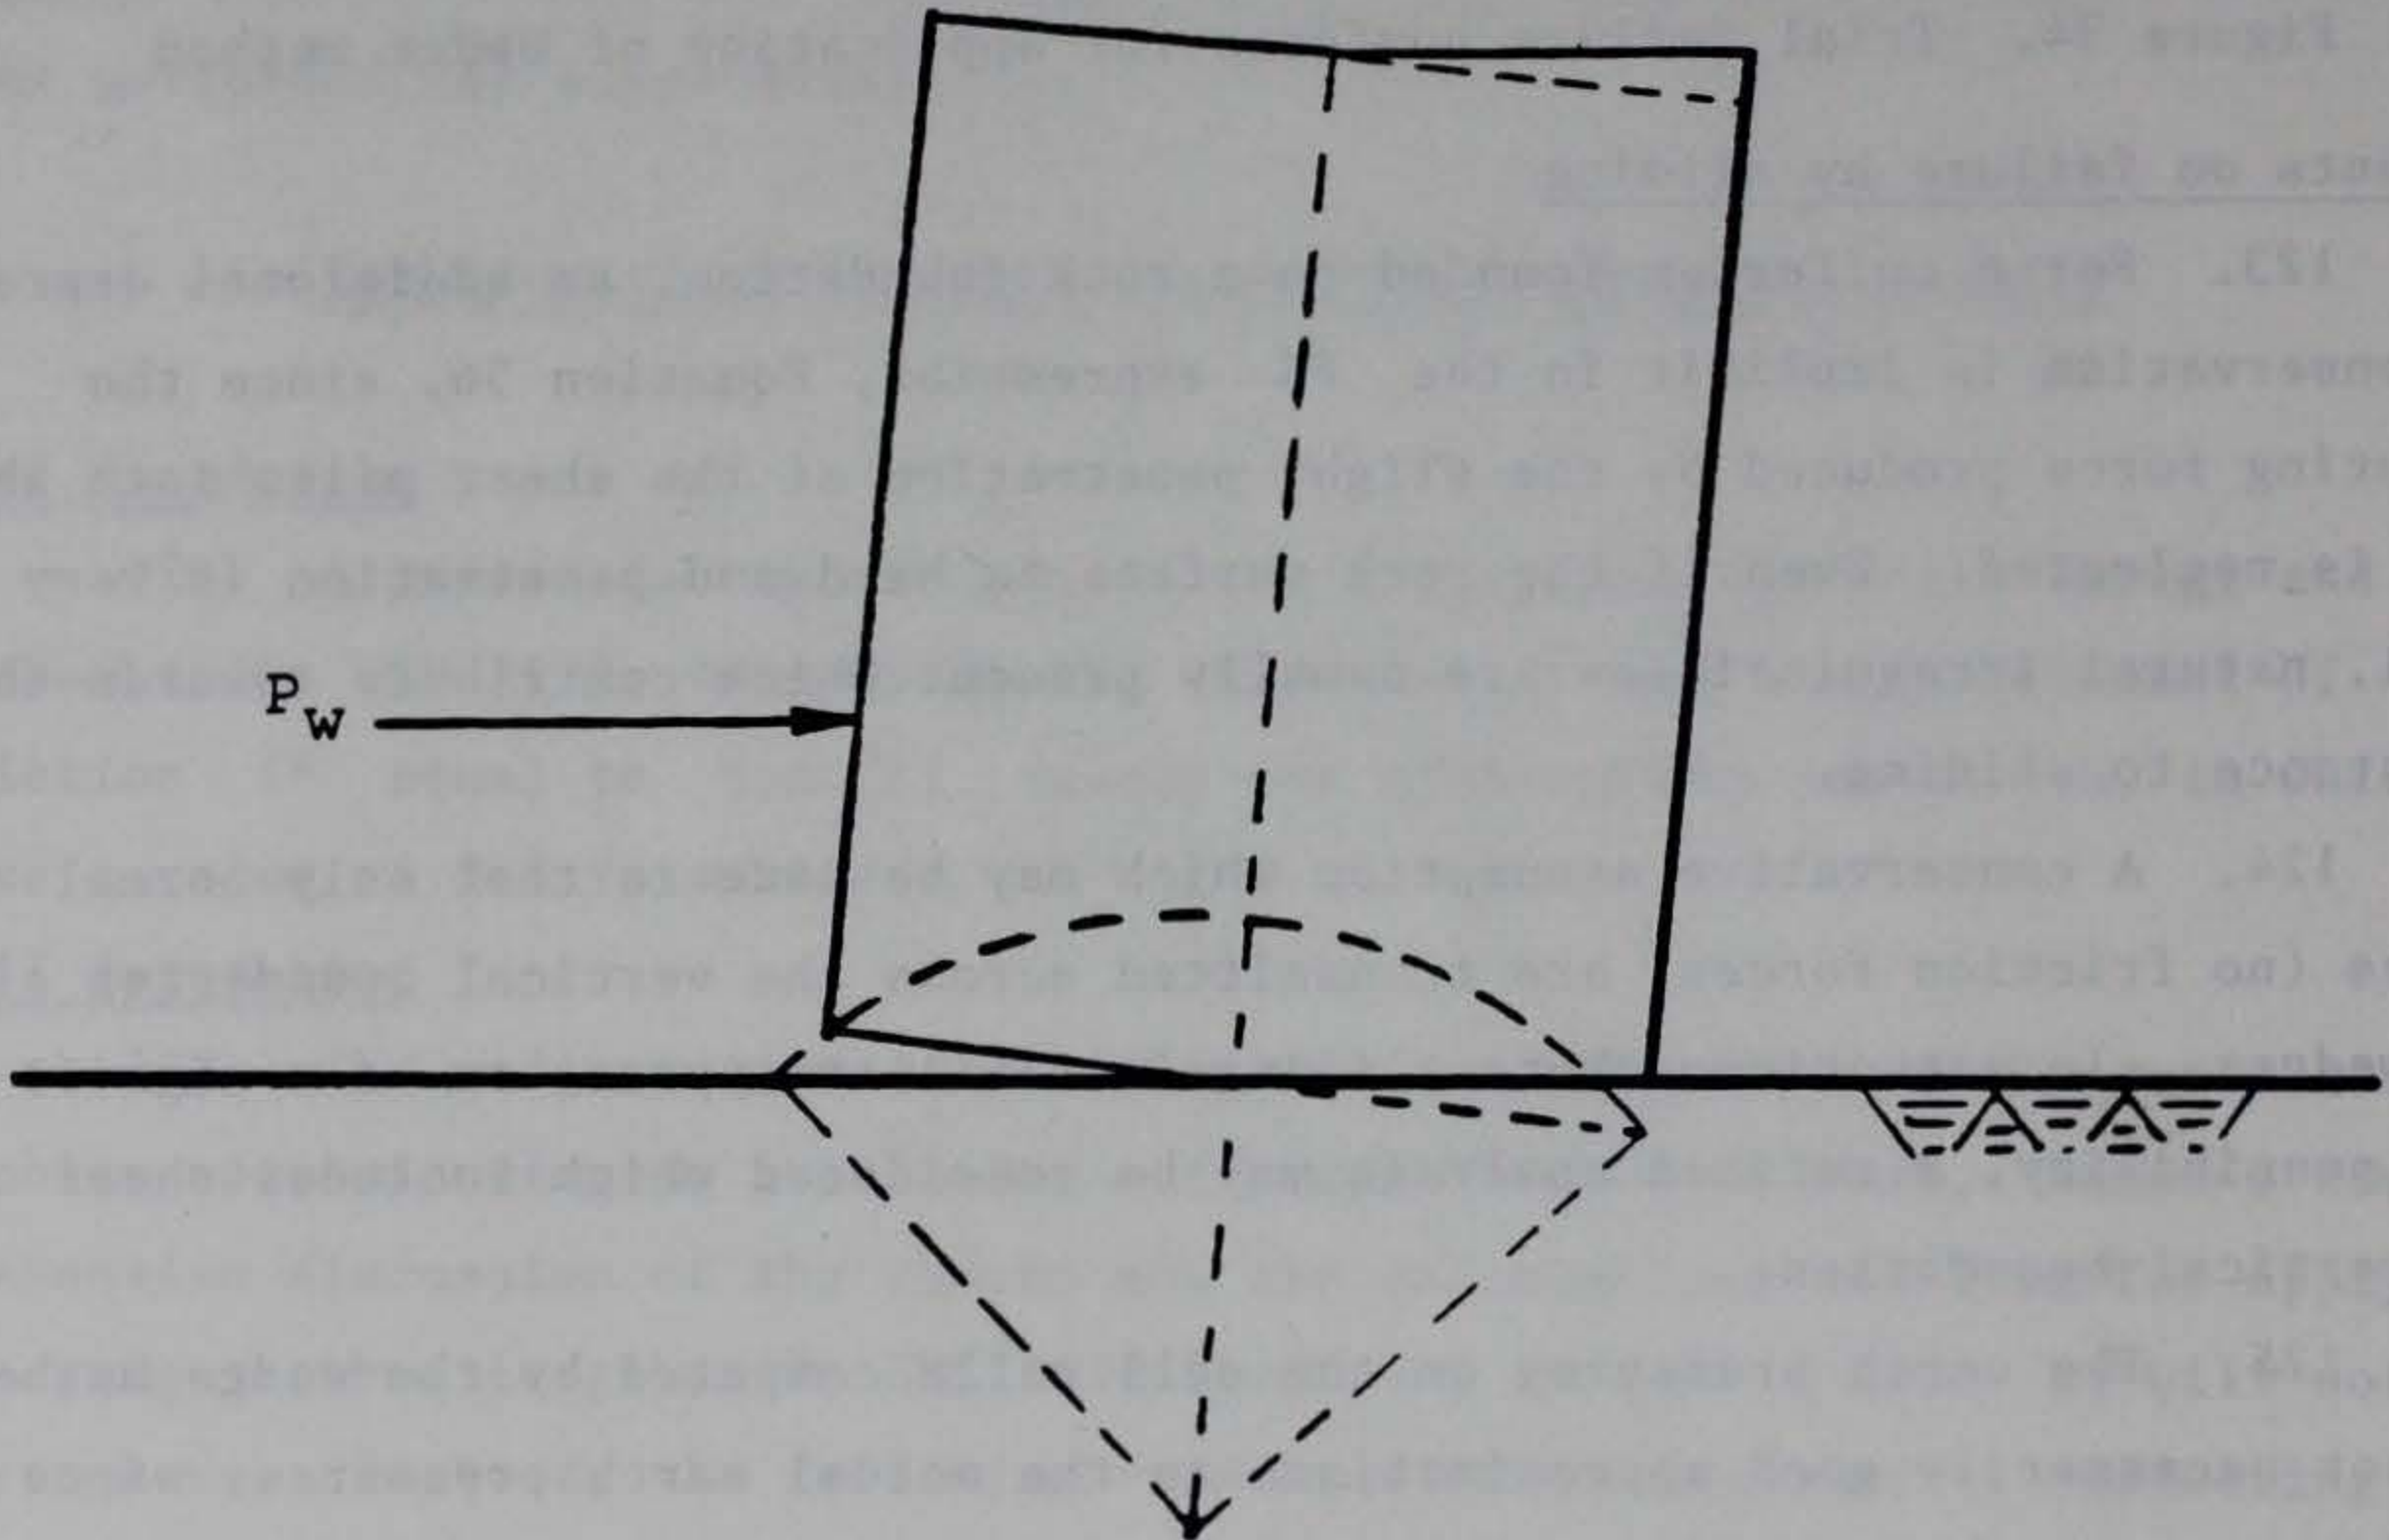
Failure by sliding on a circular rupture surface (rock foundation)
